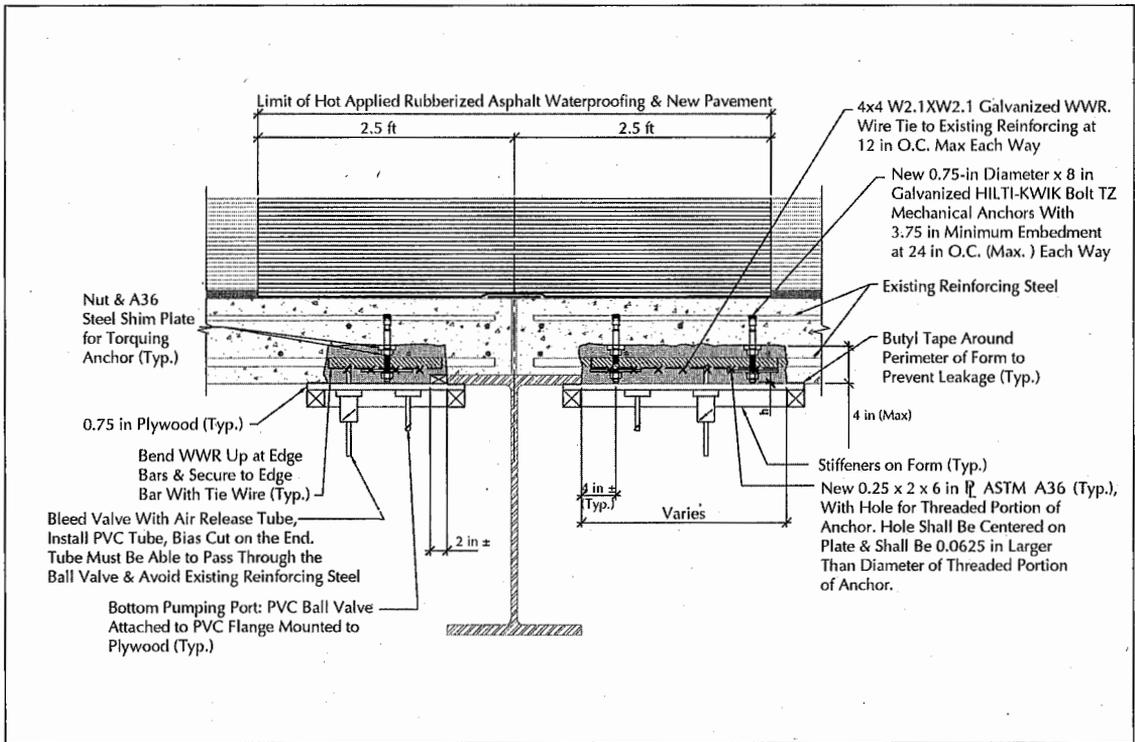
Partial depth repair detail at the concrete roof slab.
